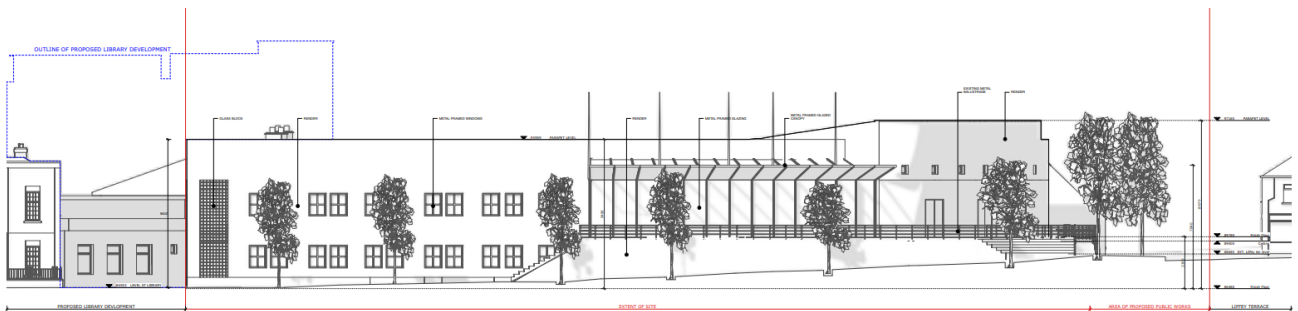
Existing Sections, Riverside Arts Centre viewed from the north (Source: Studio Red Architects)
